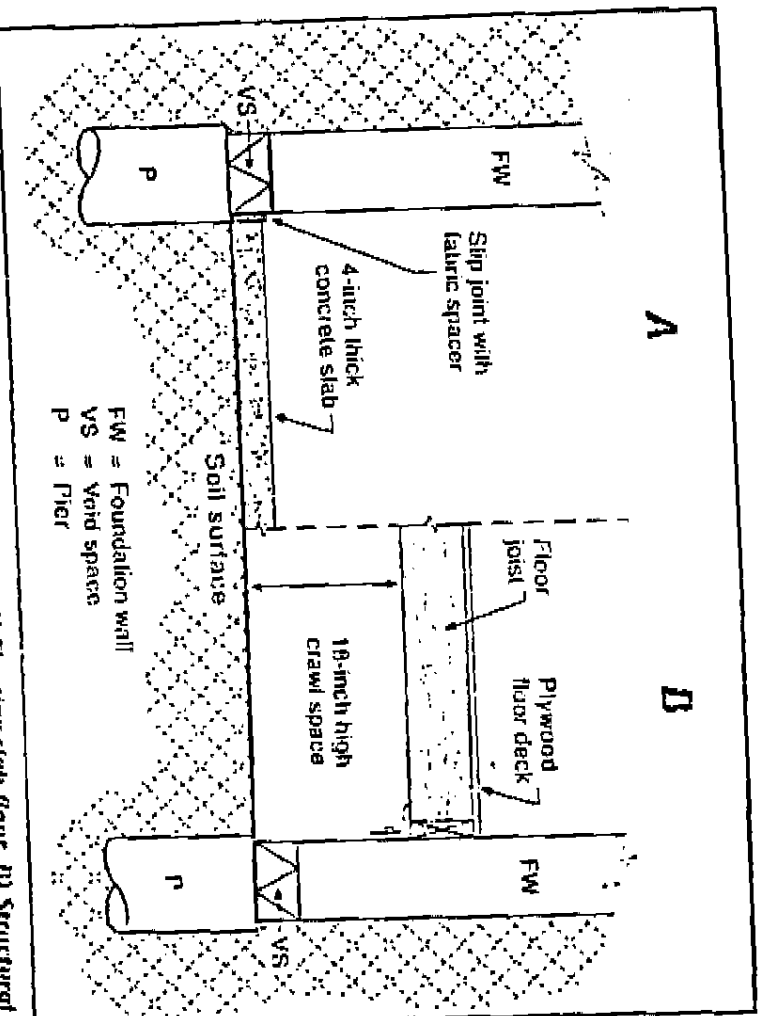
Two types of basement floor systems. A) Floating slab floor. B) Structural floor and crawl space.
